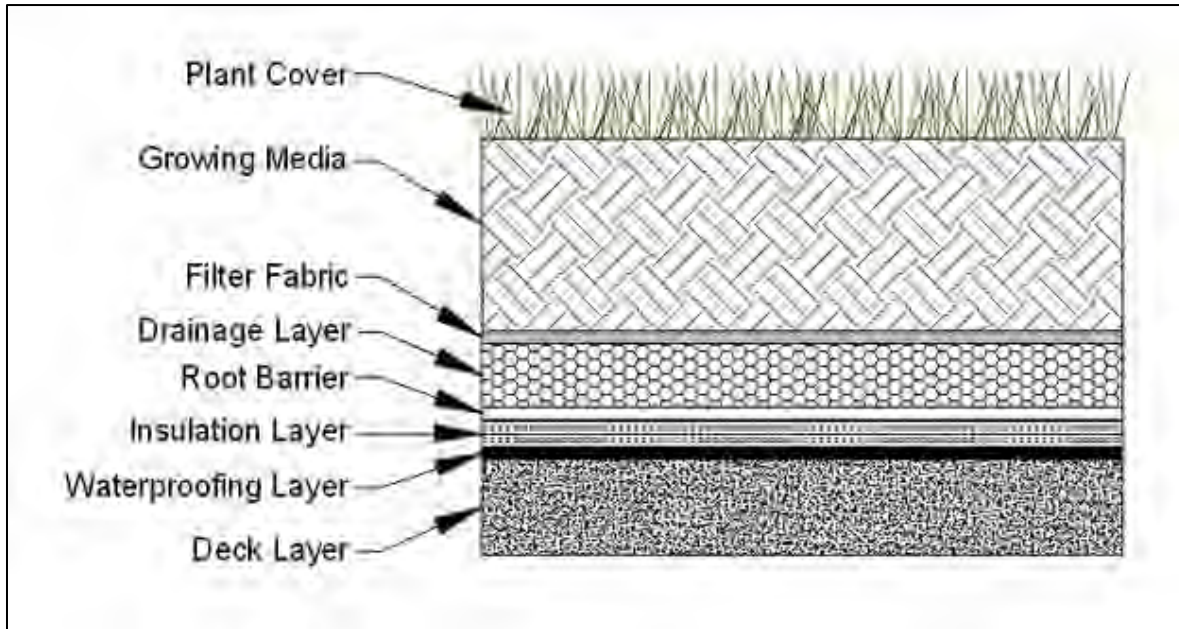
Green roof layers (note: the relative placement of various layers may vary depending on the type and design of the green roof system).
